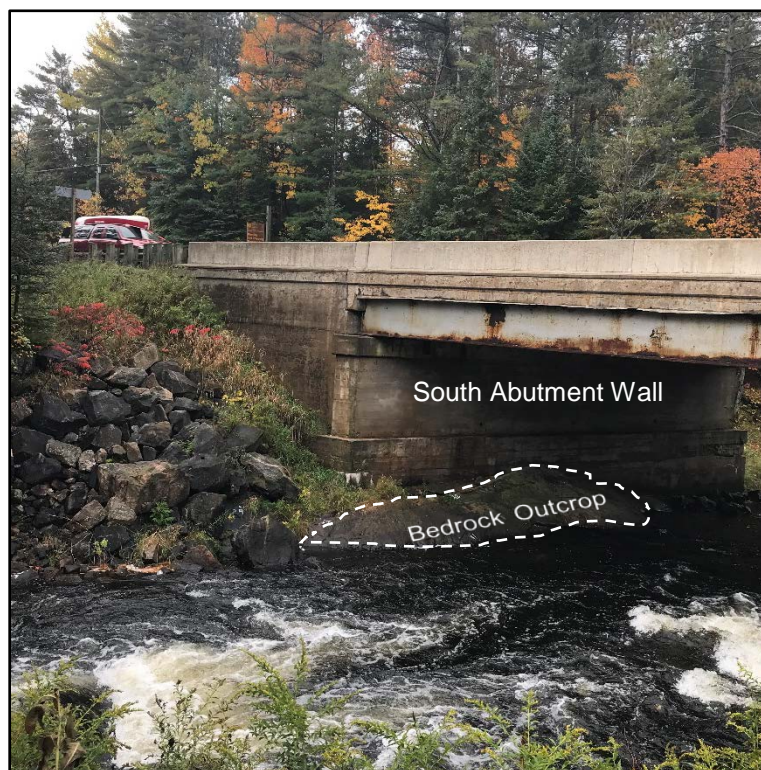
Looking at bridge skew from Highway 28 – looking south
